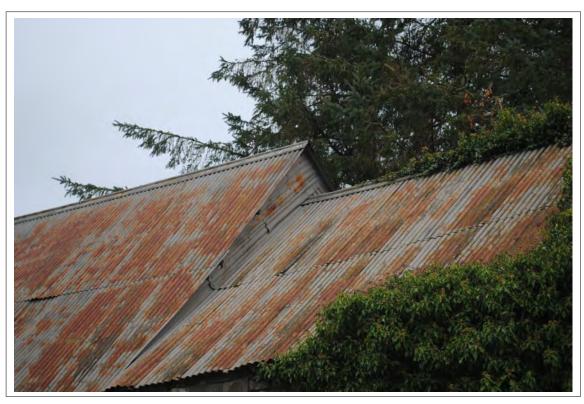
Detail of the corrugated steel roof, with a change in height between the main barn (left) and cowhouse or looseboxes (right). Looking east-northeast.
